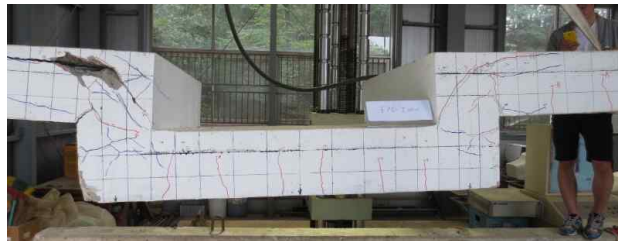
Cracking of specimen-6 by loading stage
